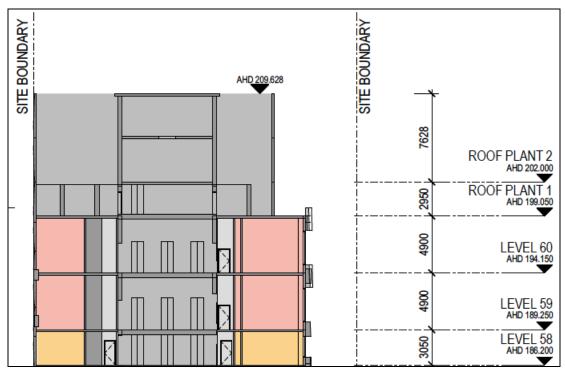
Endorsed Section showing the use of the top 20 metres of the tower
